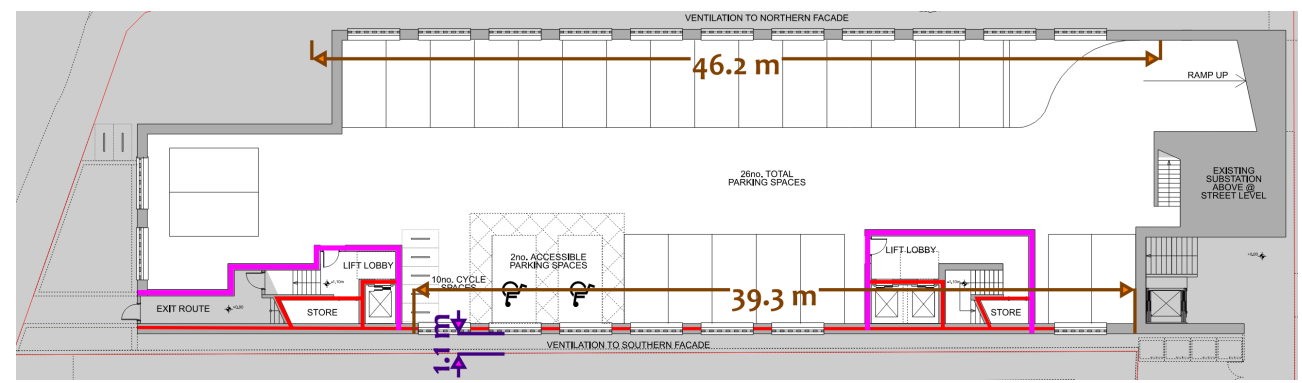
Typical above-ground compartment dimensions (First floor indicated)
